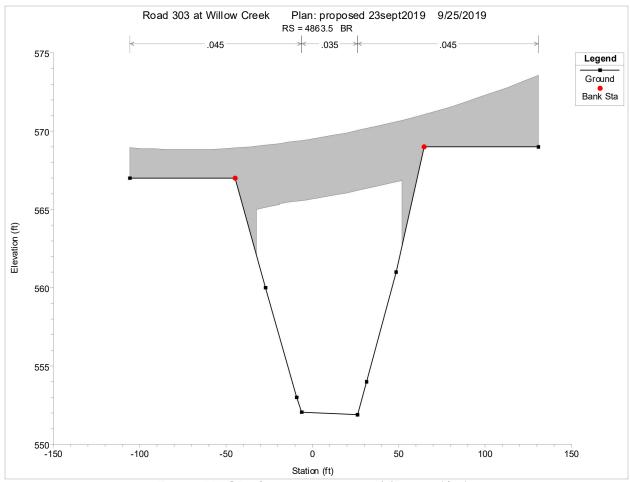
HEC-RAS upstream cross section of the proposed bridge.
